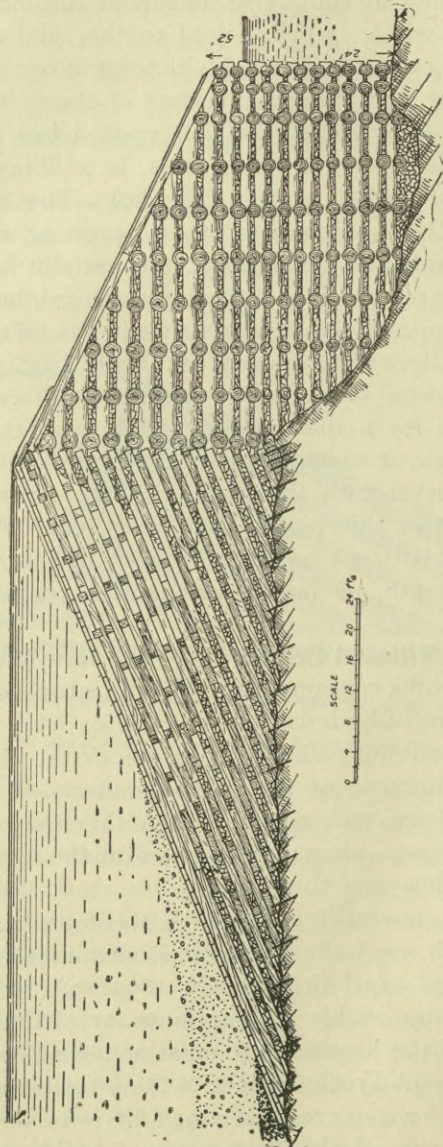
CROSS-SECTION OF HOLYOKE WEIR.
